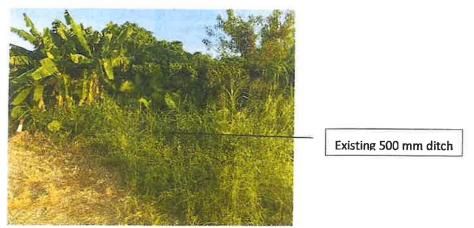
At the south side outside the lot boundary is a village road, further beyond is an existing 500mm ditch covered with grass.
